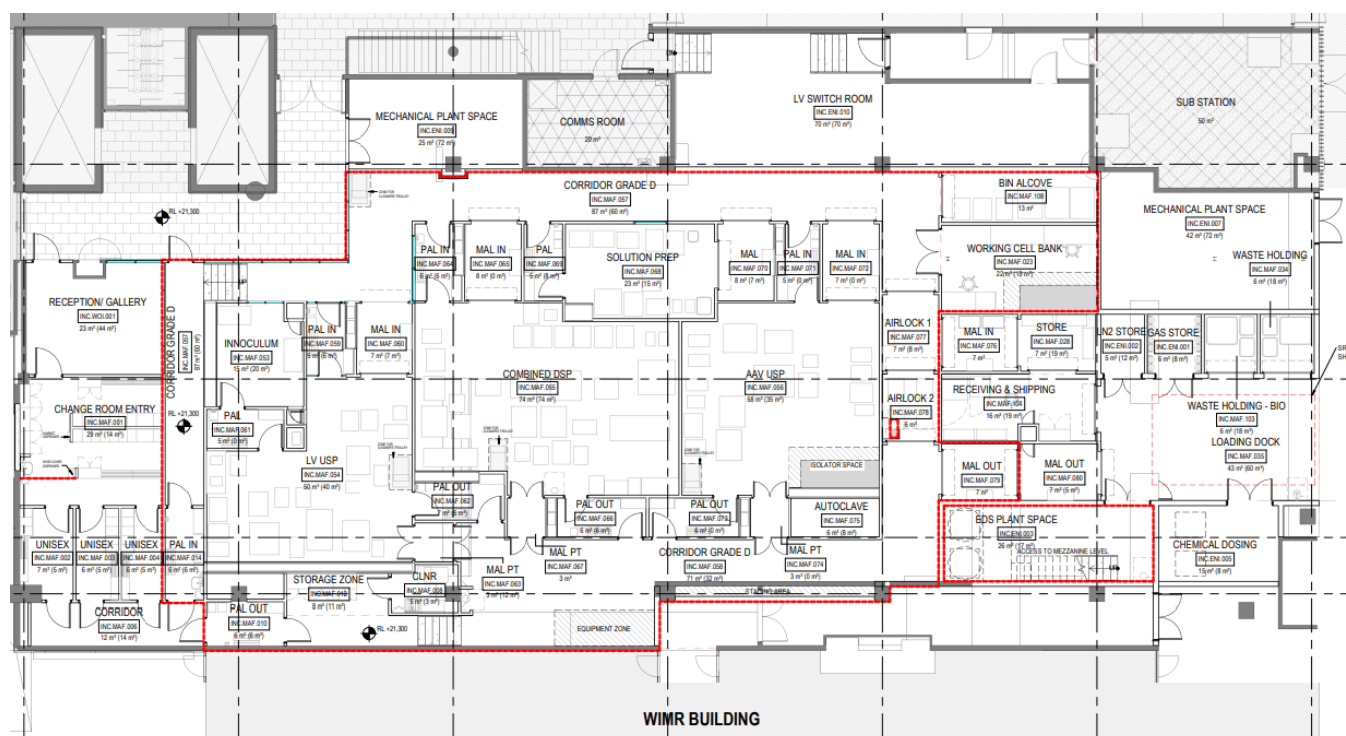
Proposed IC Level 1 Plan (Source: HDR)
